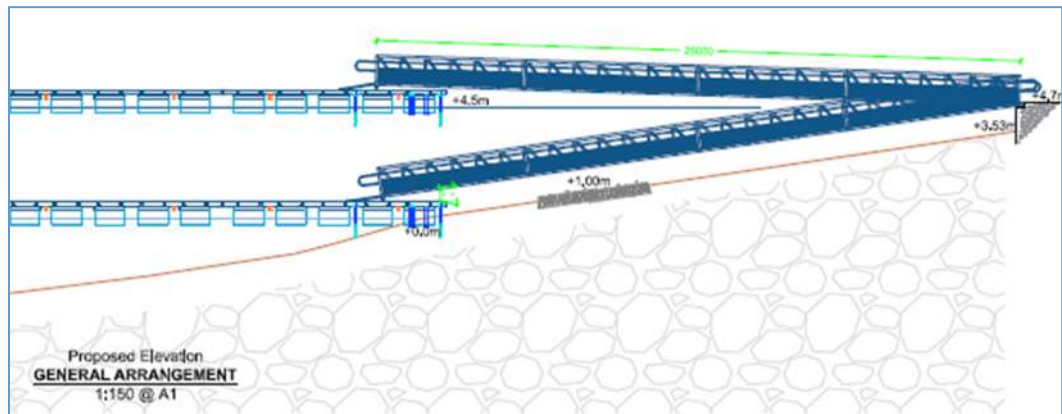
Schematic of proposed access walkway and pontoon (provided by Applicant)
